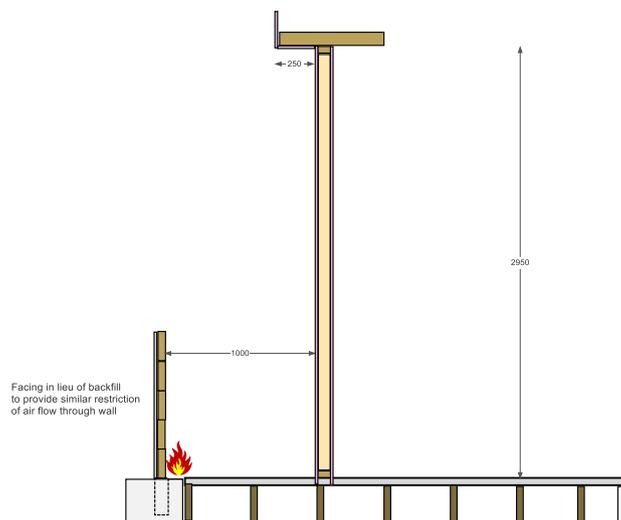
Section AA Garden bed retained above path with wall facing reference building - radiant heat perpendicular to face of the sleeper wall
